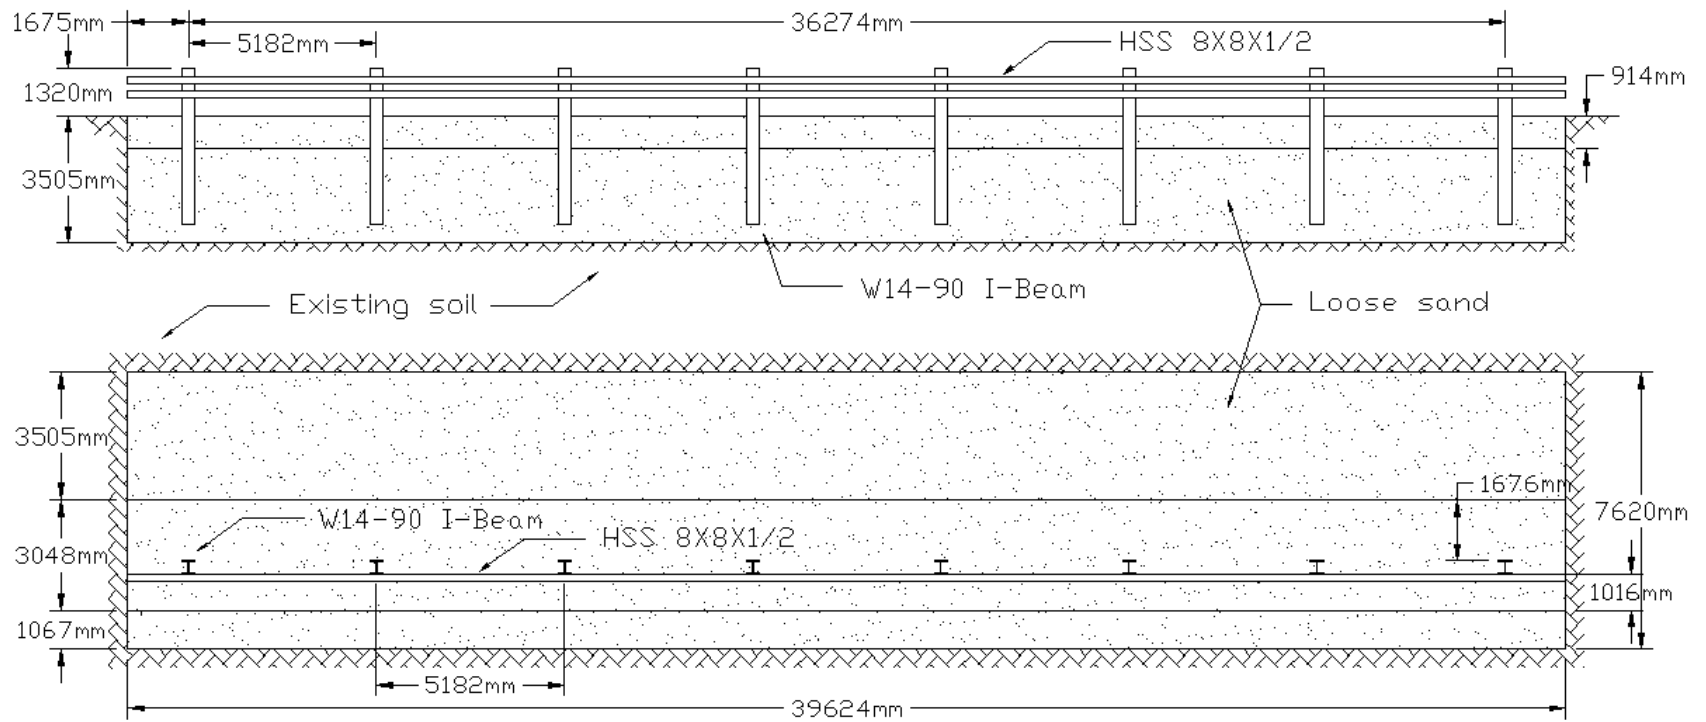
Plan and front elevation of the group of posts system in the loose sand
